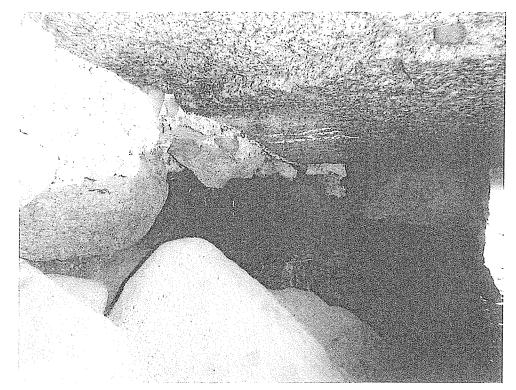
Slab 14-Complete loss of bearing area at the west breastwall.
